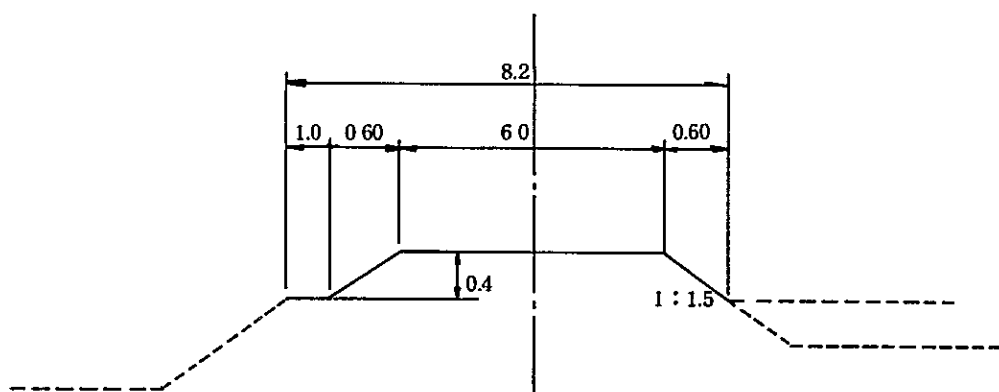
3 - 10 Farm Road Standard Section (Unit : m)
